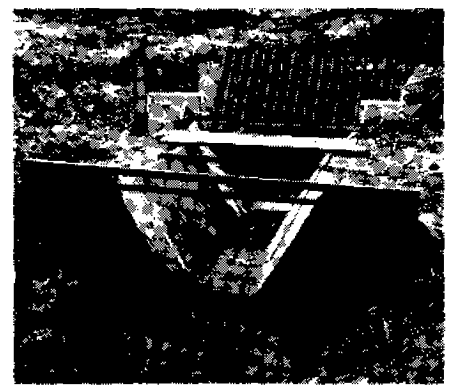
Flume No. 3 installed in irrigation ditch. Structure downstream is intake for an underground pipe system.
